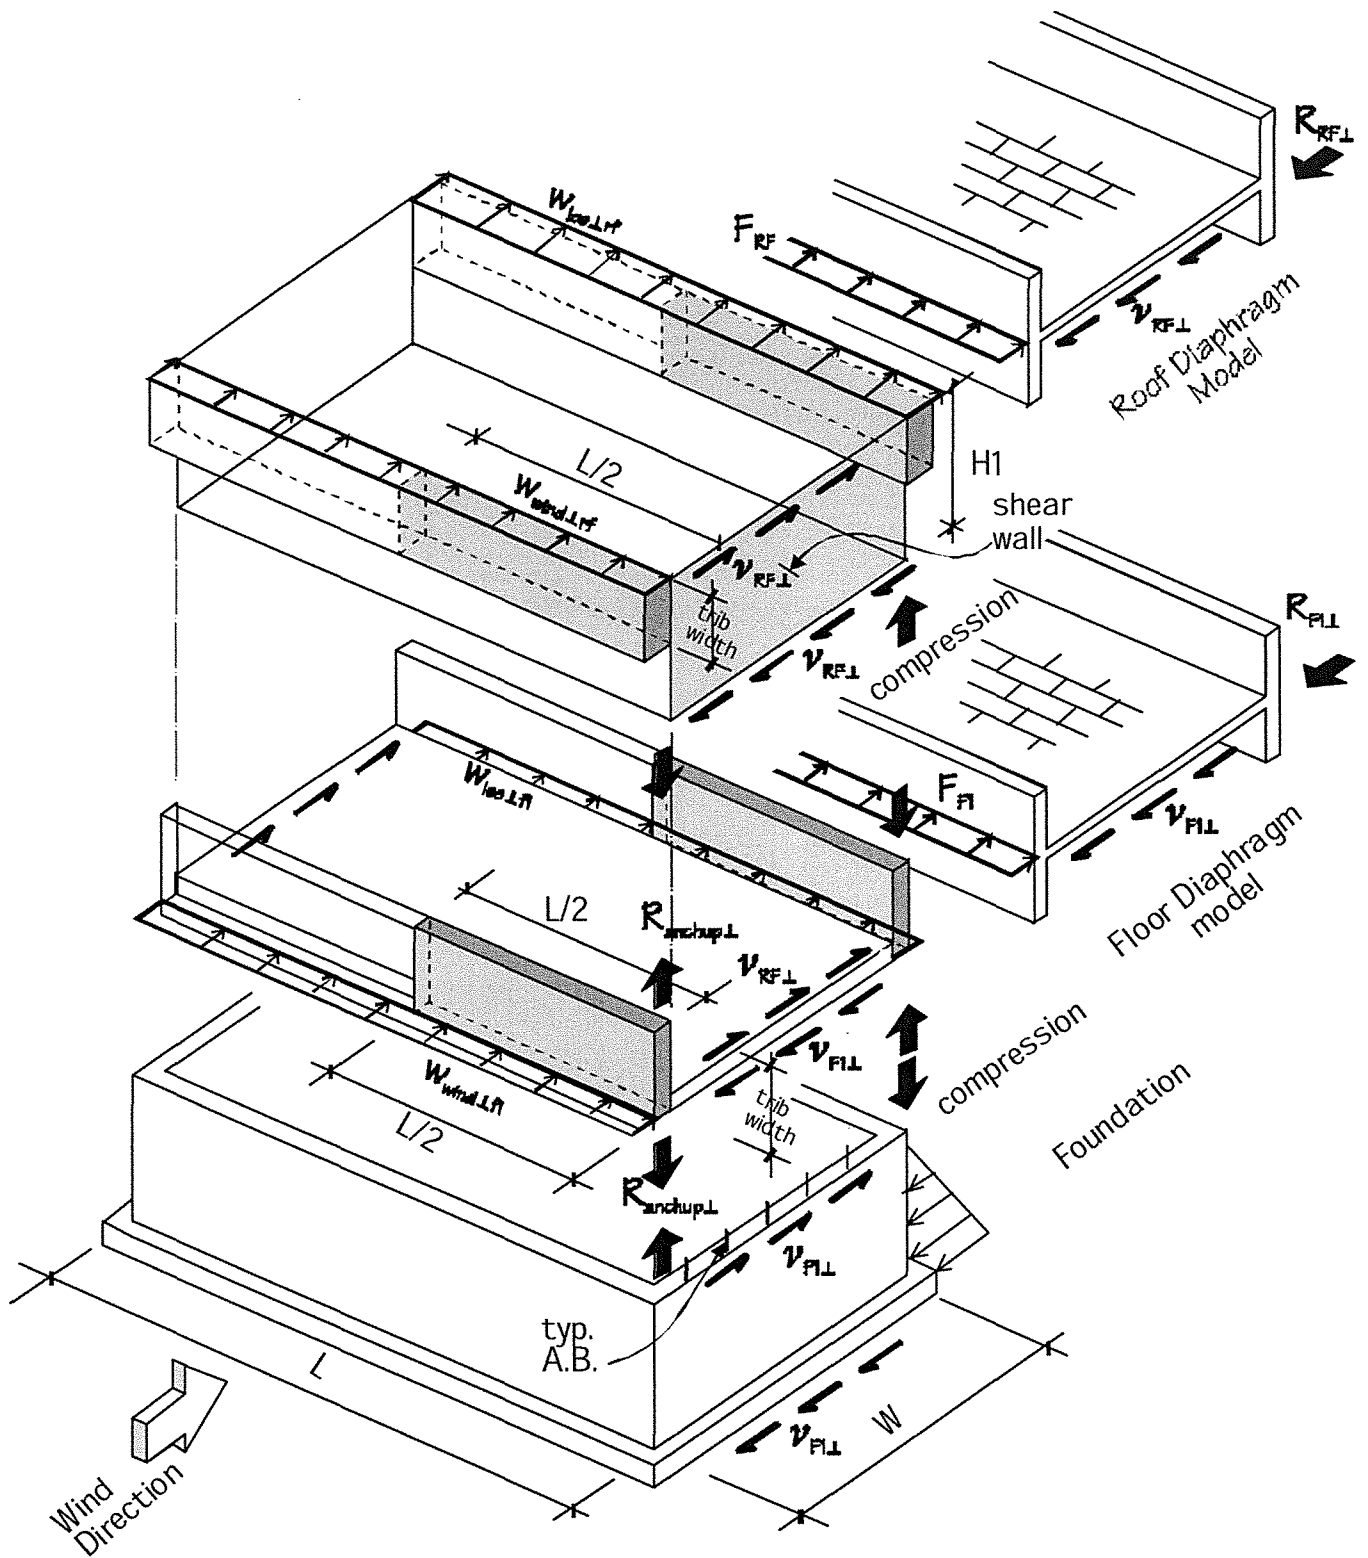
Exploded View of One Story Diaphragms and Shear Wall
